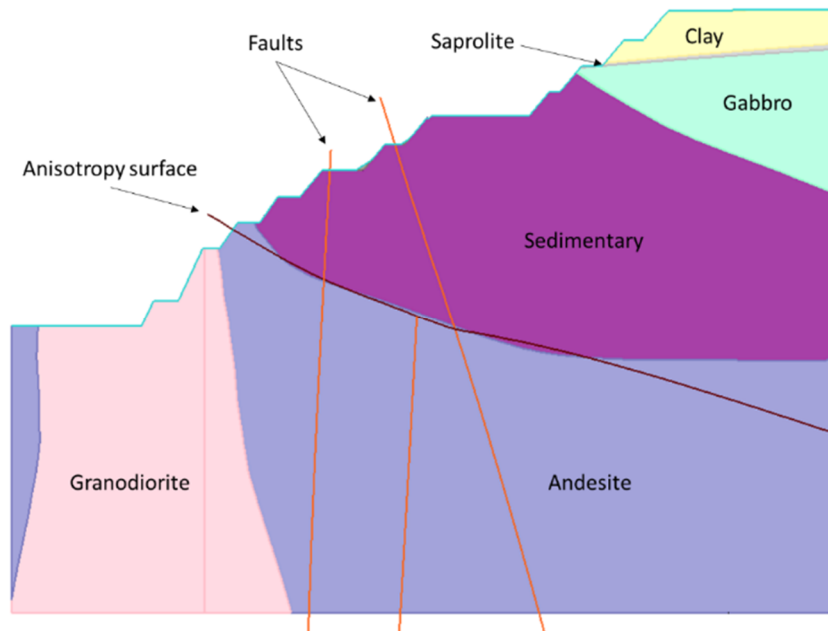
Typical section of geotechnical domains at the south wall (looking east)
